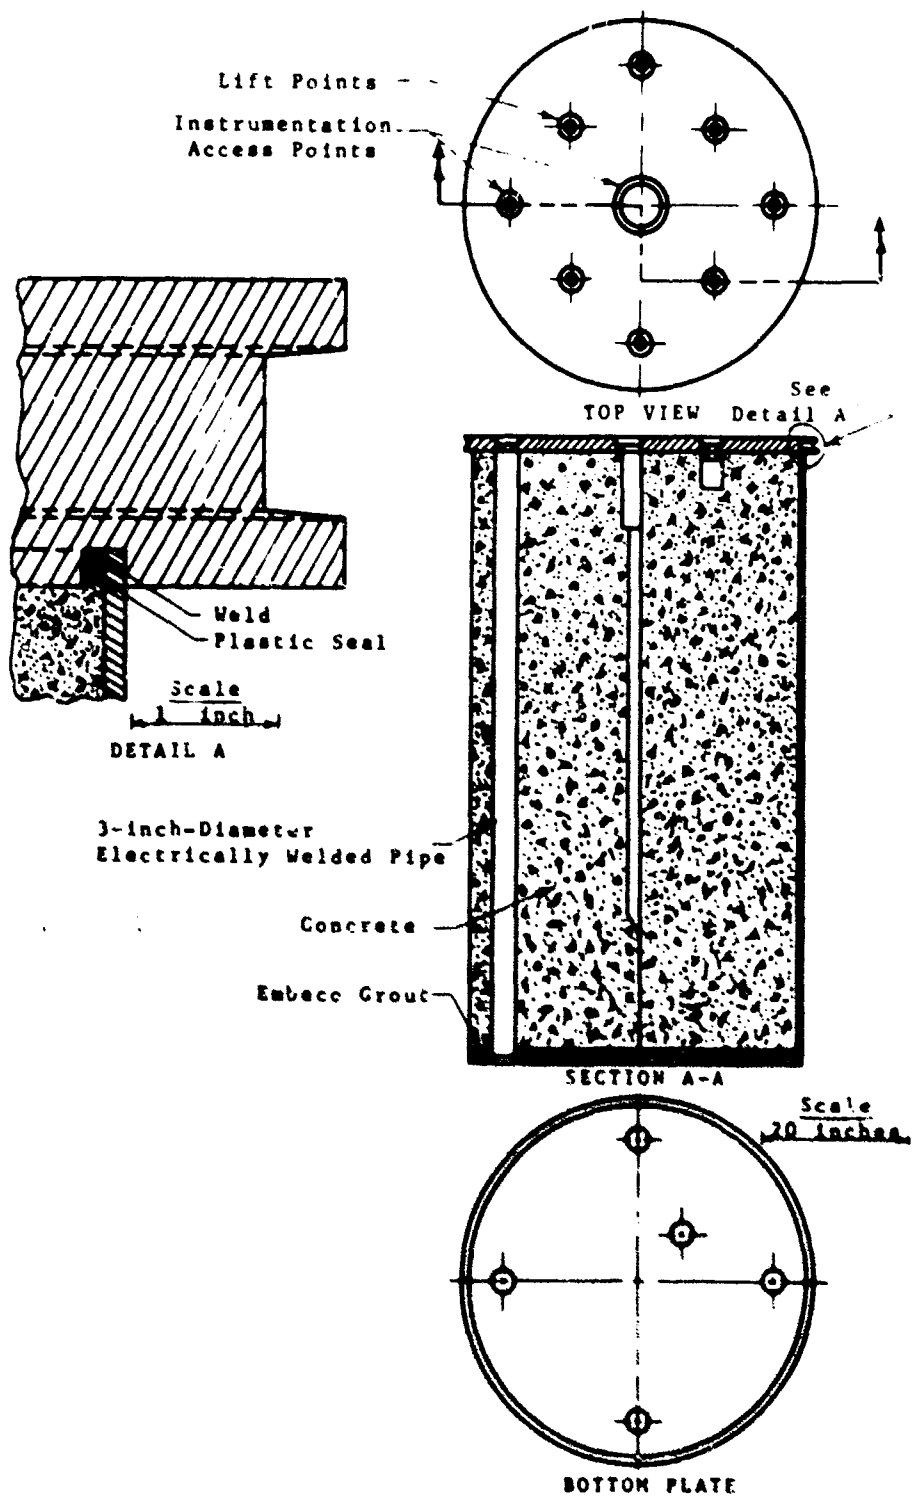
WORKING DRAWING OF CONCRETE PEDESTAL
